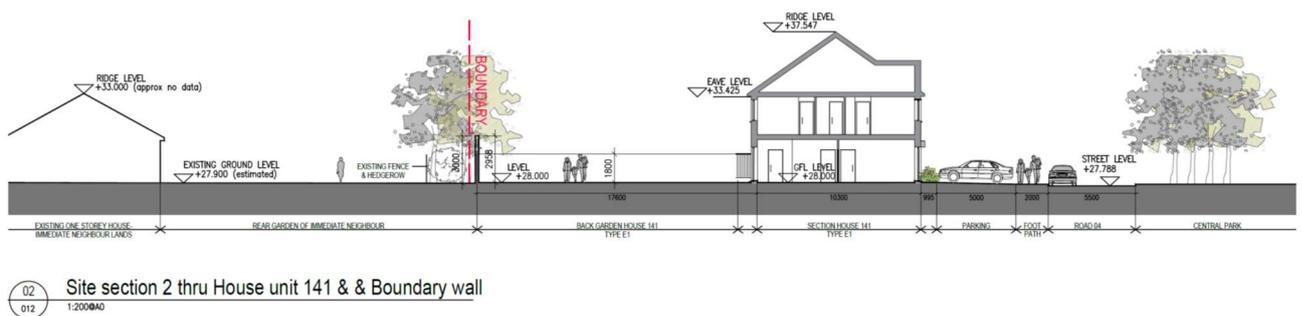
Site Section 02 taken from submitted drawing no. 6204-P012
